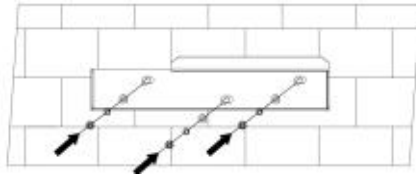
Fixing and Locking the Wall-mounting Bracket
